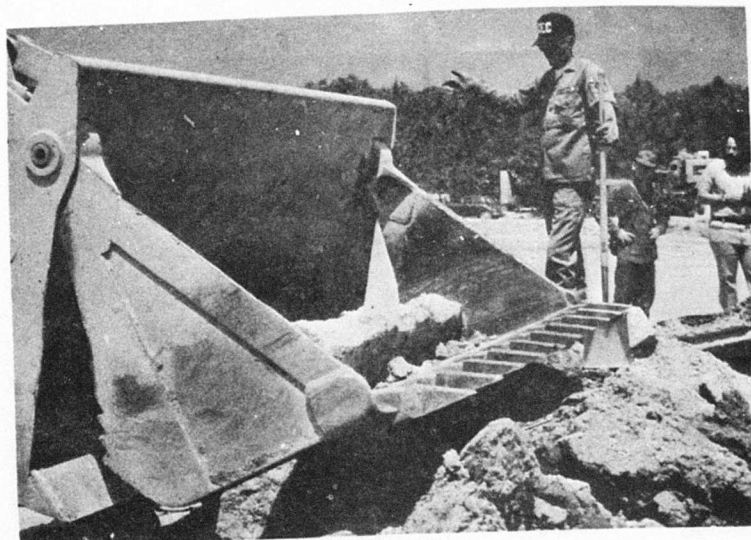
C. Test 1-2, AC 745 Loader Lifting and Carrying Upheaved Pavement
